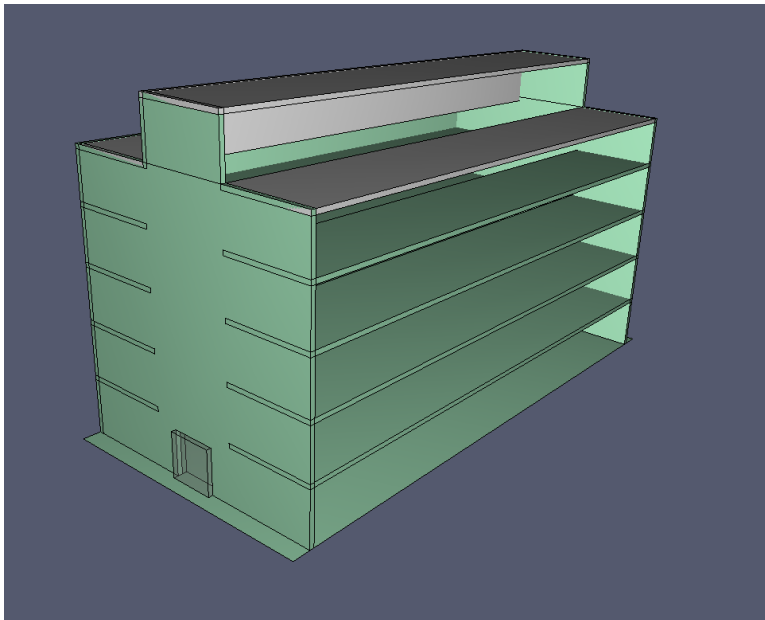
After walls and roof have been added. In this figure, the right wall and right reservoir have been hidden.
